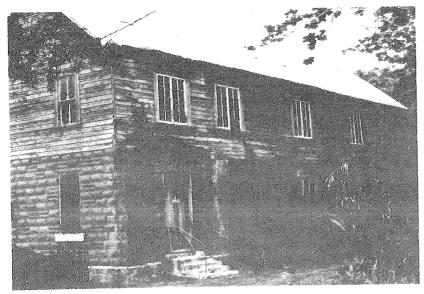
Illustration No. 44. View from southwest showing the Founder's House in late 1976. The exterior wood siding at the second floor, as well as the second floor windows on the south were a 1960 renovation.
